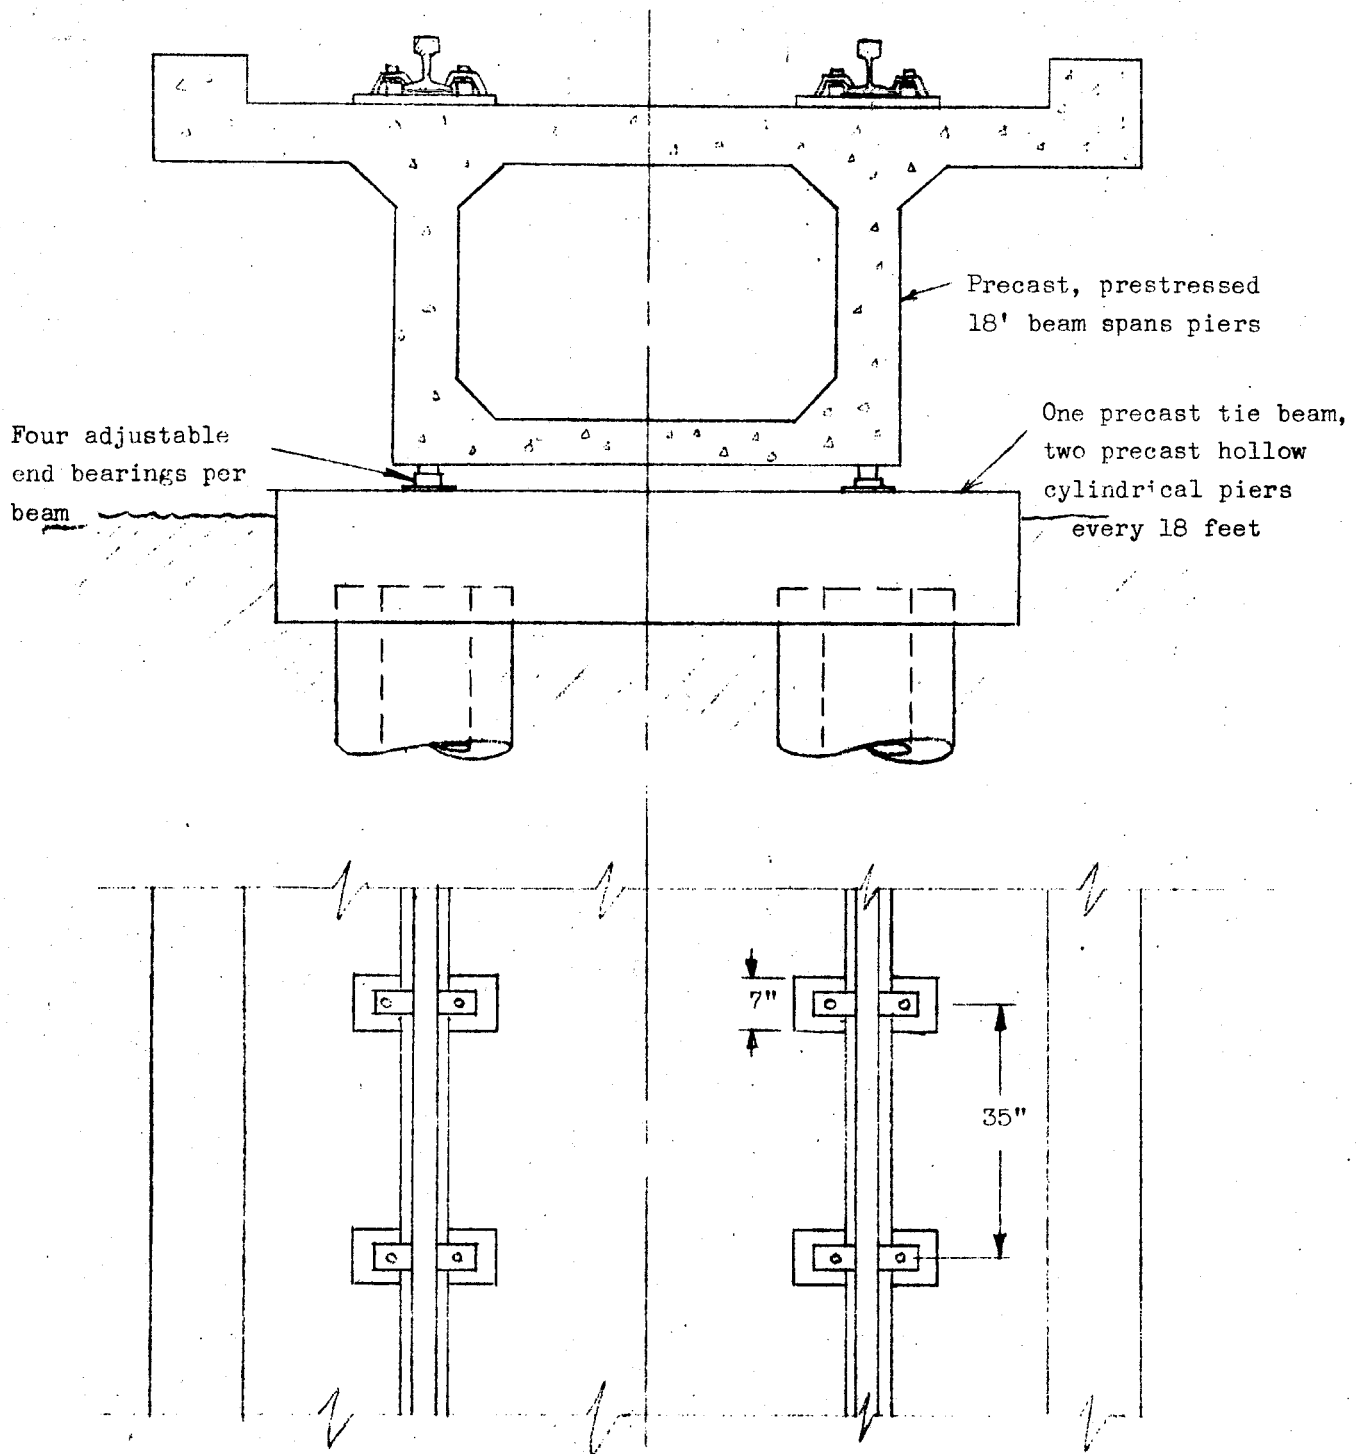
CONCRETE BEAM ON PIERS (LOUIS T. KLAUDER NUMBER 8)
